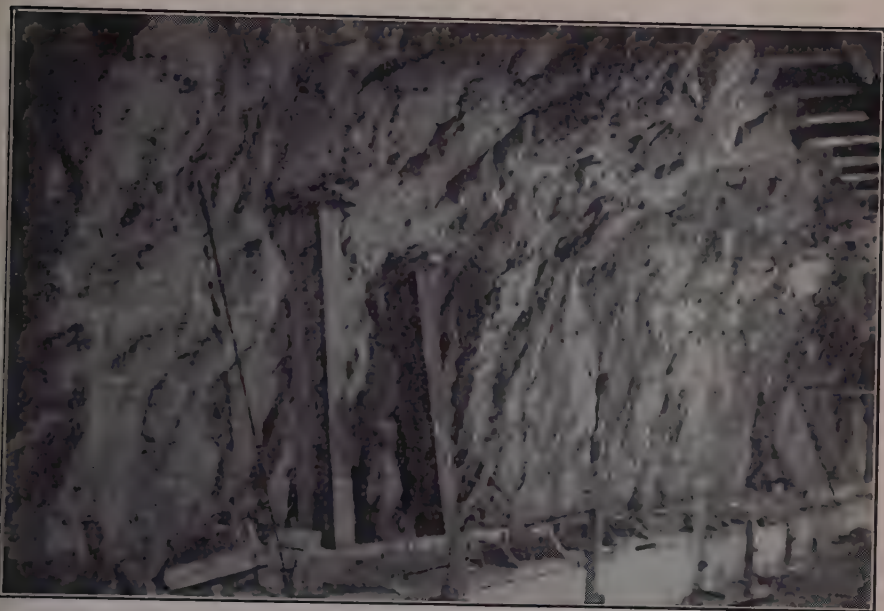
INCIDENTAL SEAM BRACING IN THE DOUBLE TUNNEL; WALL BENCH CONCRETED
